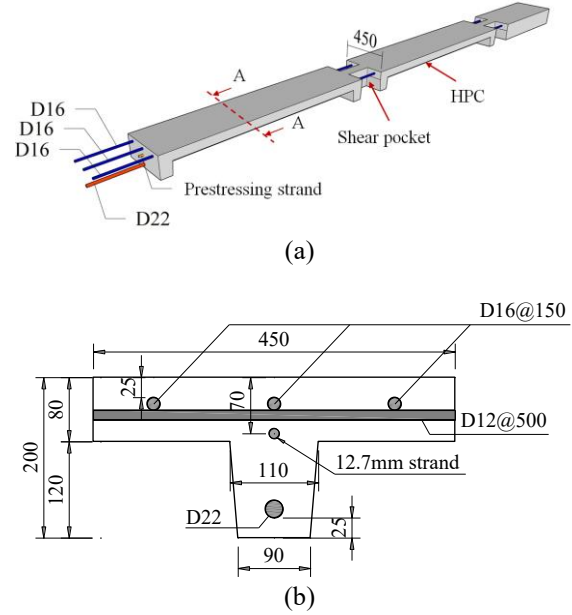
Details of the test specimen: (a) 3D view of the test specimen; (b) Details of Section A-A
